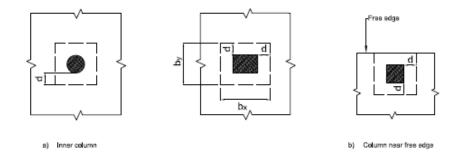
Cross-section for design check of shear capacity for concentrated load on plates
